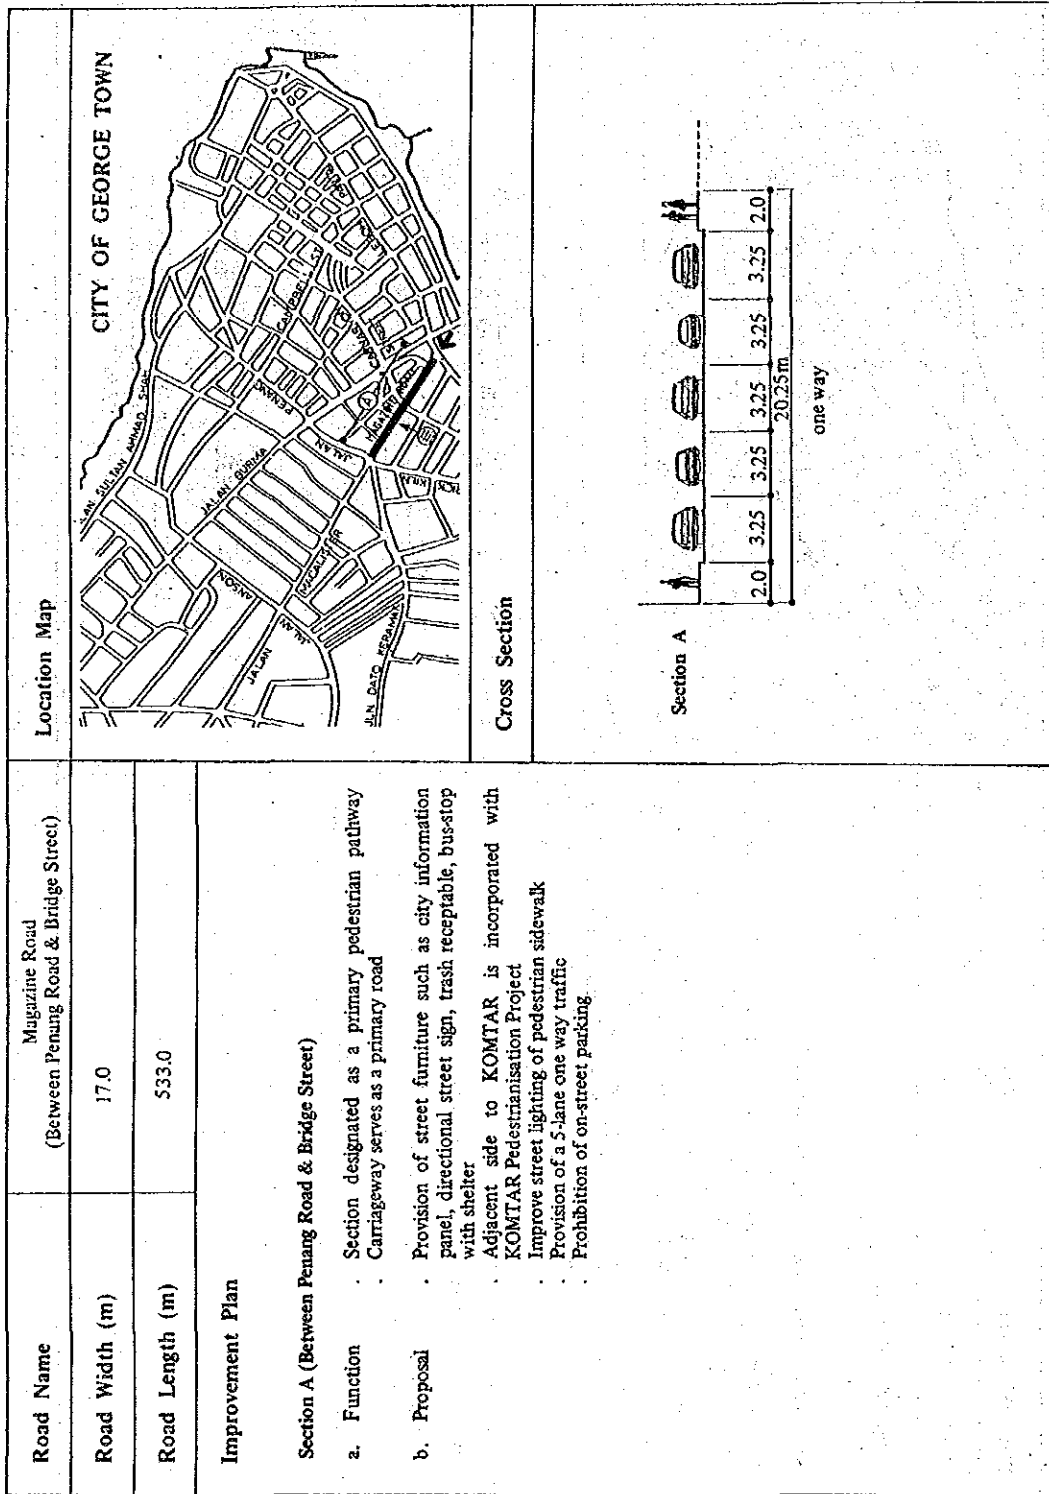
Pedestrianisation Improvement Plan (15) – Magazine Road
